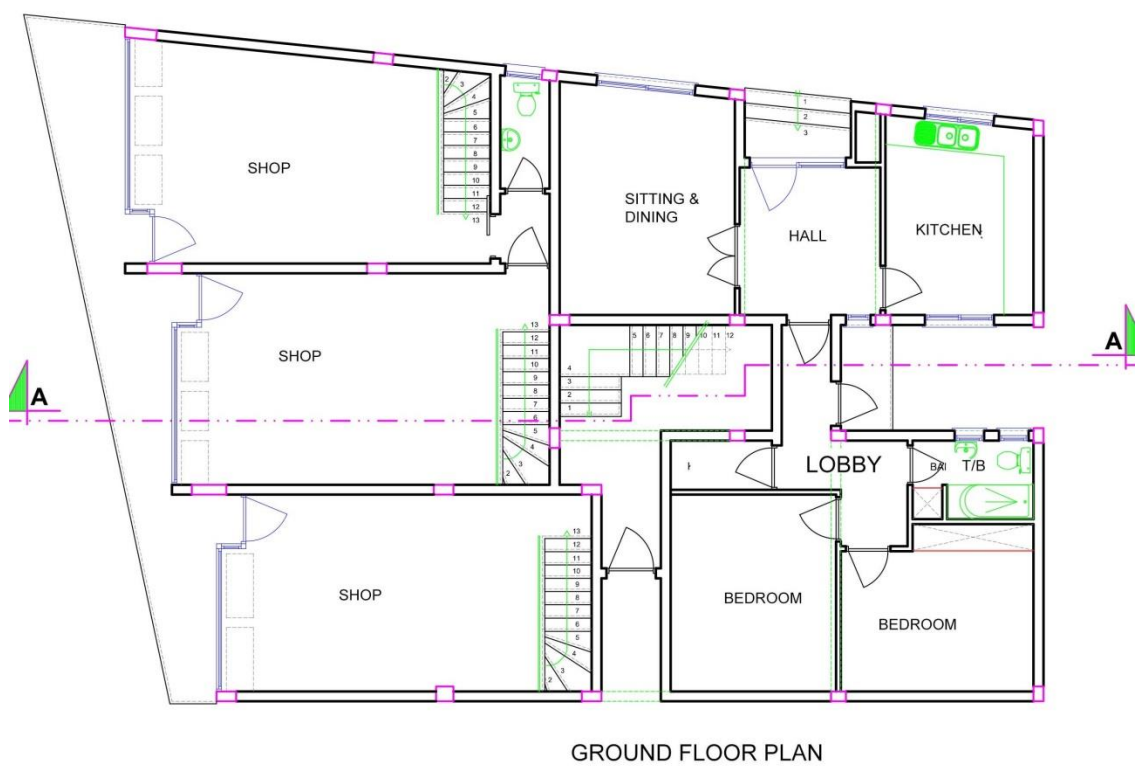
Ground floor plan Efecan Building Complex; (Owner, 1973)
